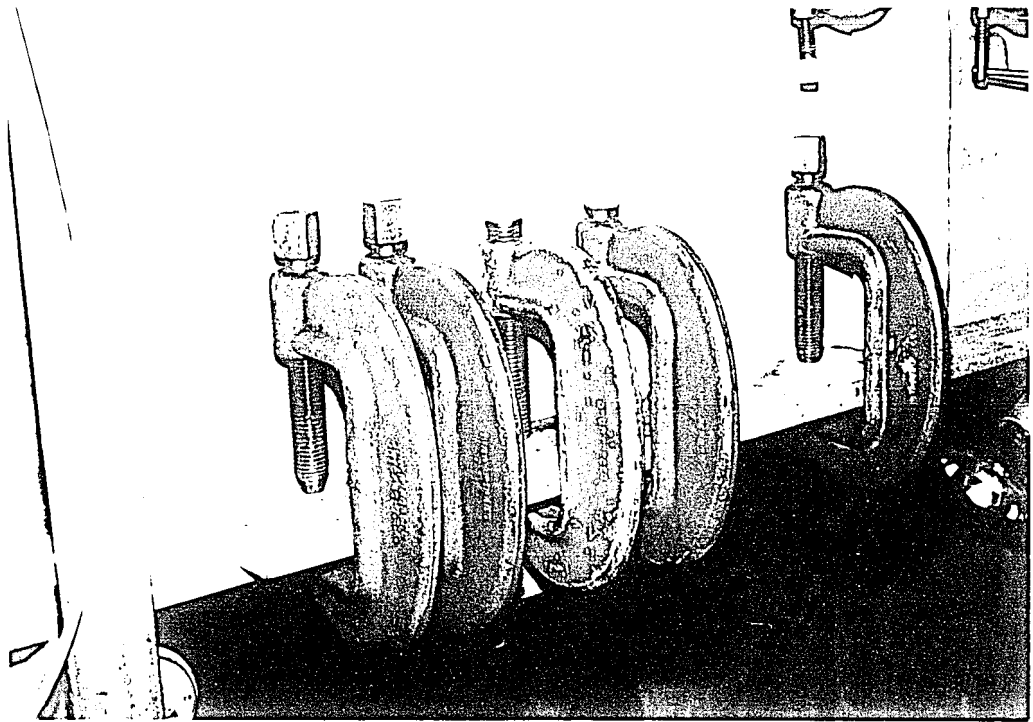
Typical Splice of Groove Welded Test Beam. This Allowed for Continued Testing of Other Details on the Beam.
